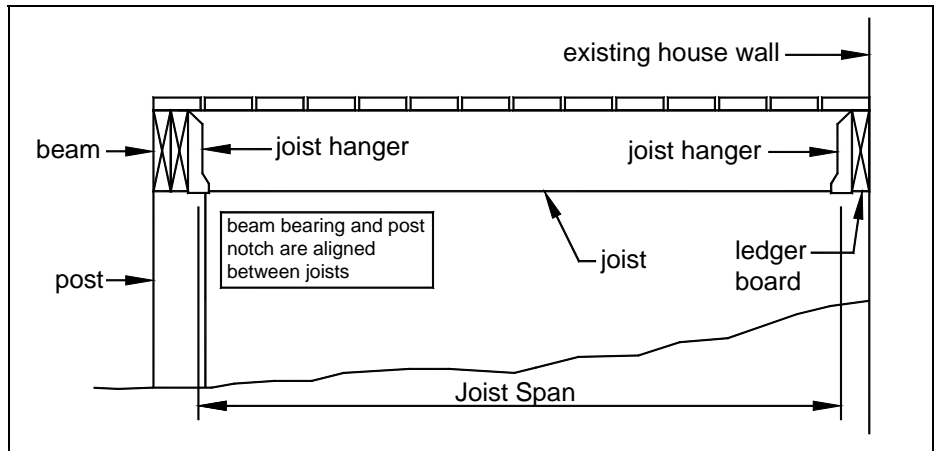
JOIST SPAN - JOISTS ATTACHED TO SIDE OF BEAM
